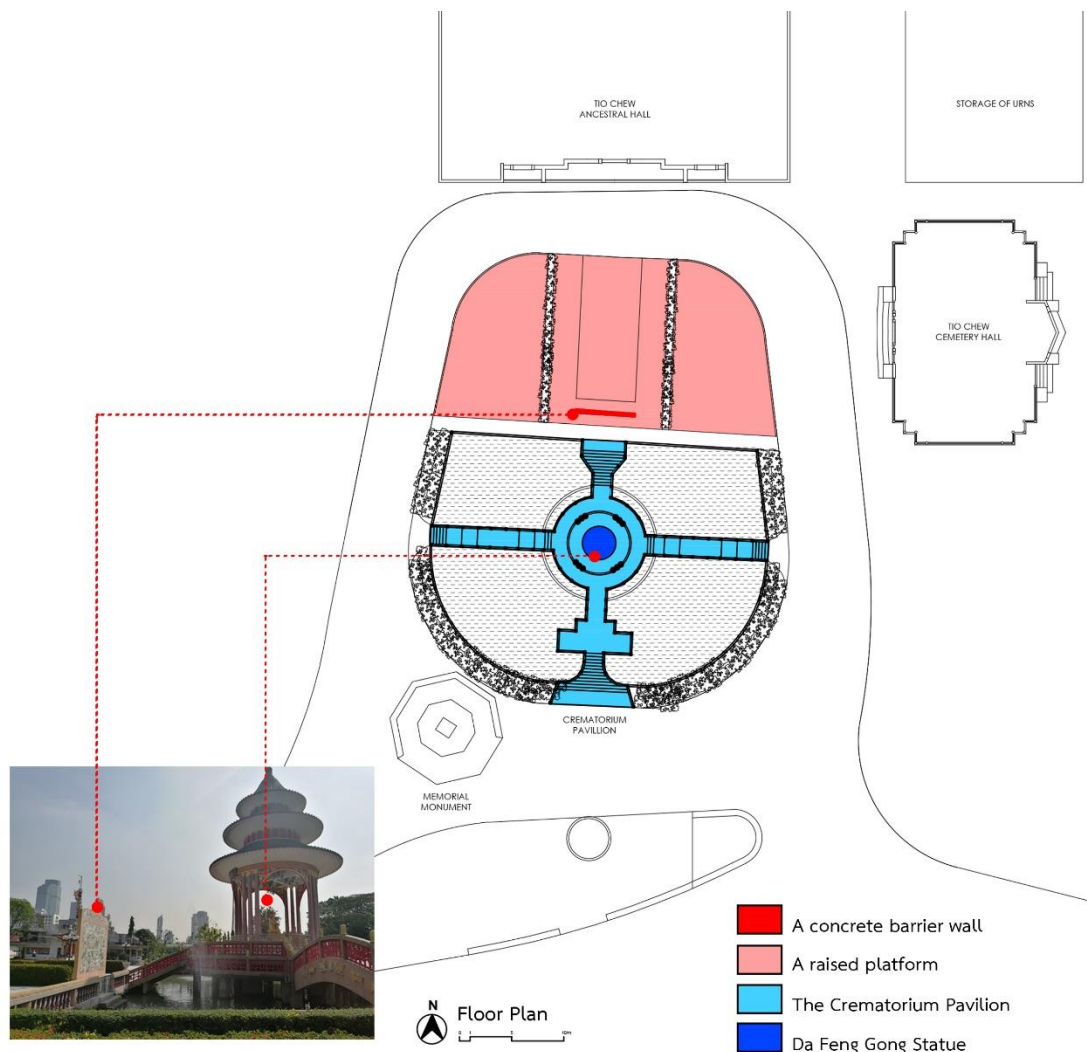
45 A concrete wall on a raised platform acts as a barrier between Tio Chew Ancestral Hall and Crematorium Pavilion.
